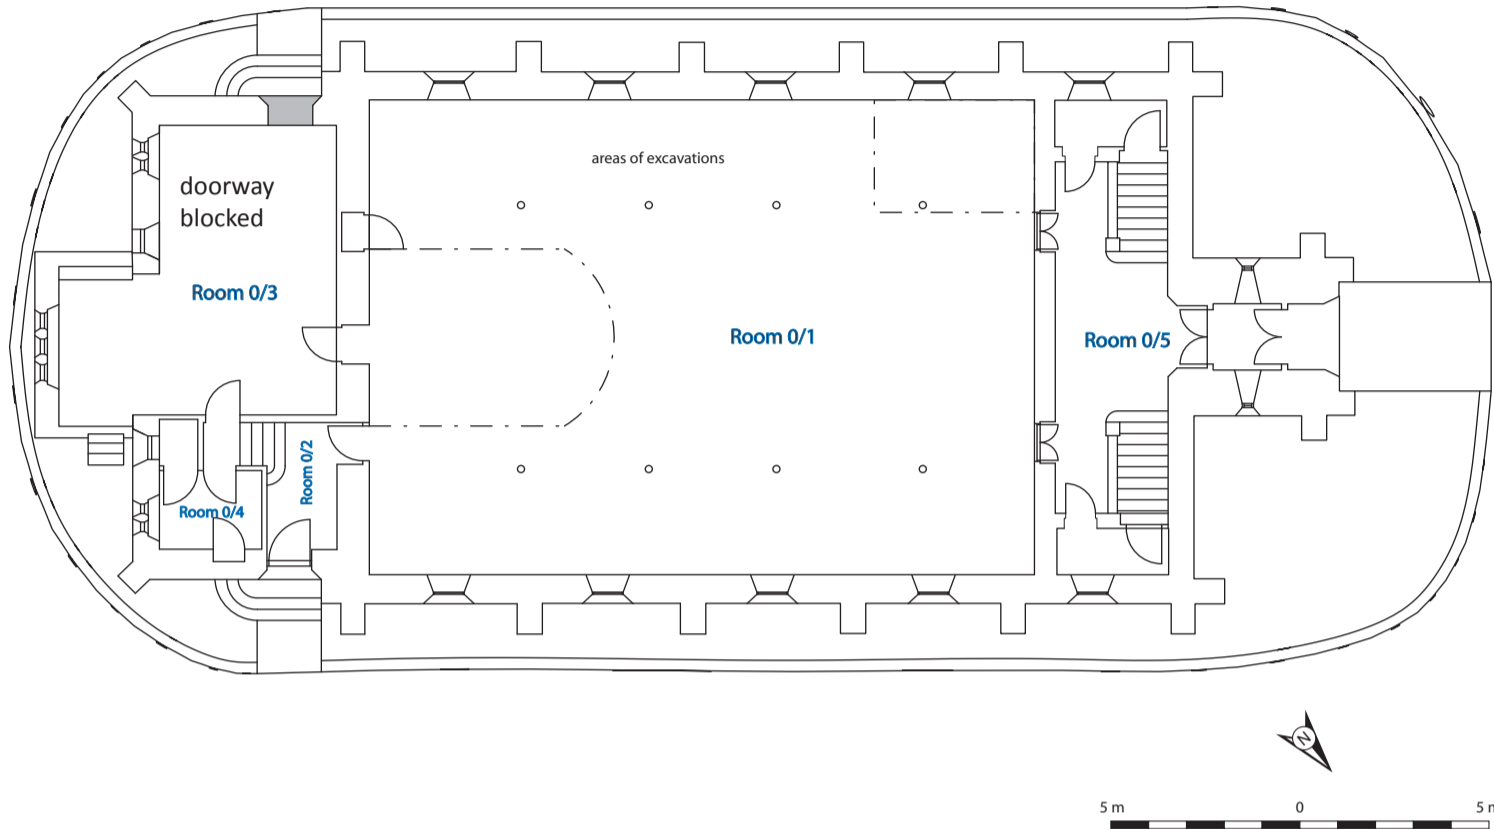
South Church, ground floor plan (provided by Grant & Geogheagan Ltd)
